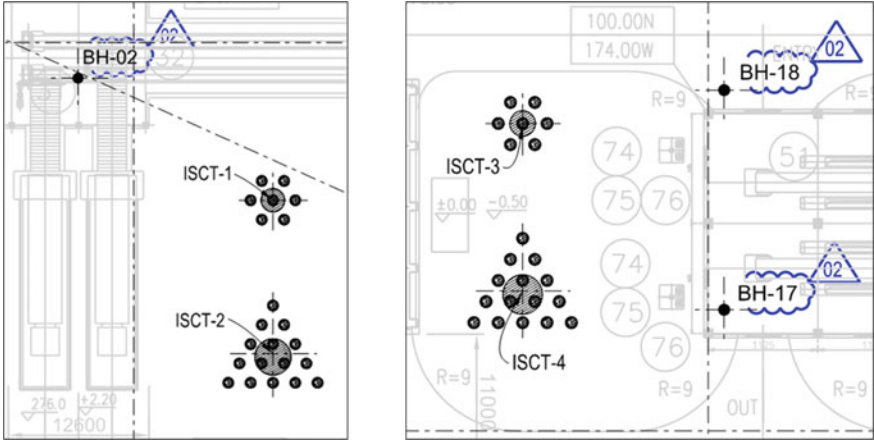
Initial stone column test layout for individual and group of stone column
